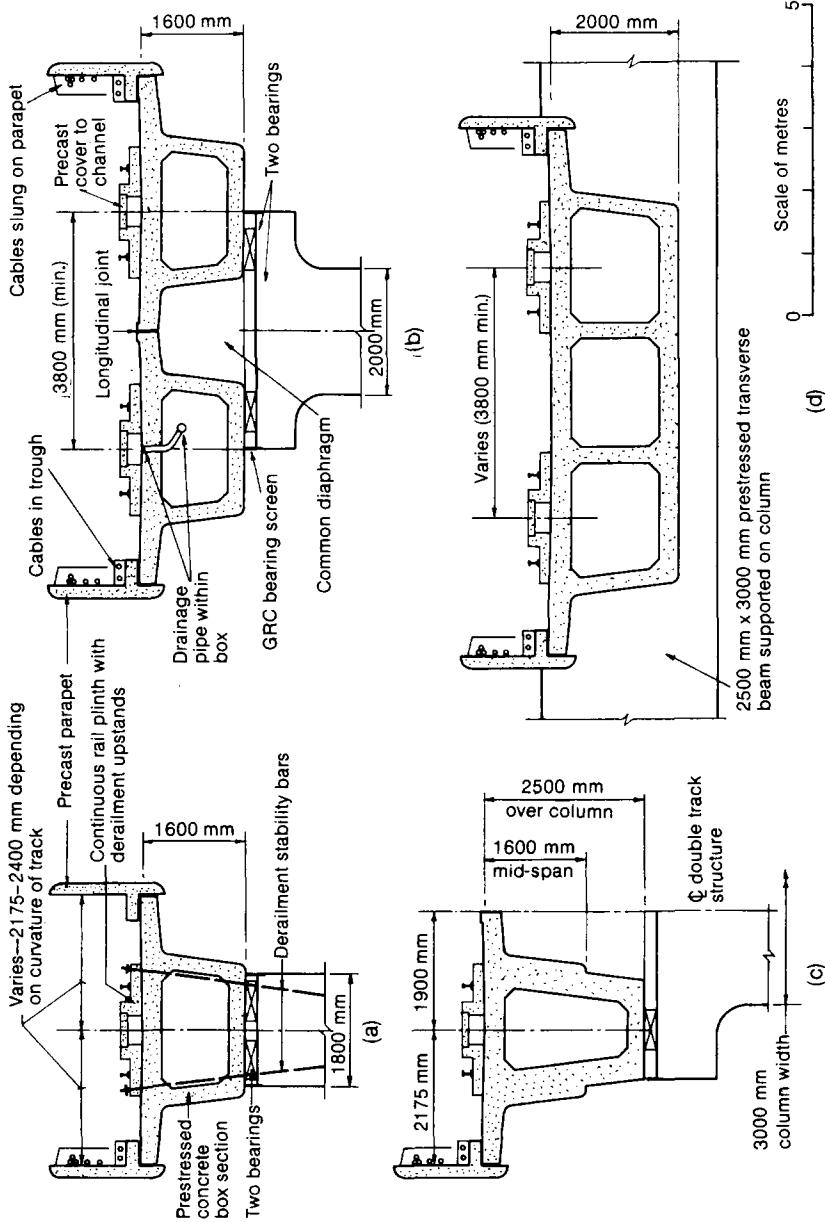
Typical viaduct sections: (a) standard single-track box and column; (b) standard double-track boxes and column; (c) section B—*B*—*launch added to achieve 52 m span;* (d) sections F and I—2 m deep multicell box on transverse prestressed beams; maximum span 44 m
